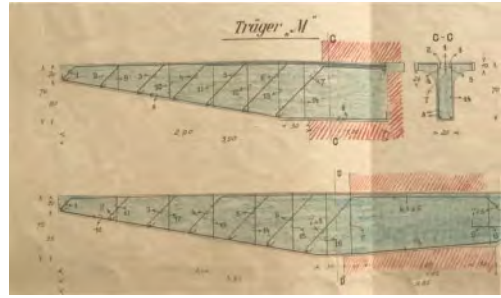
Cantilevering beam of the ground floor terrace (source: Davoser Ingenieure AG DIAG).
